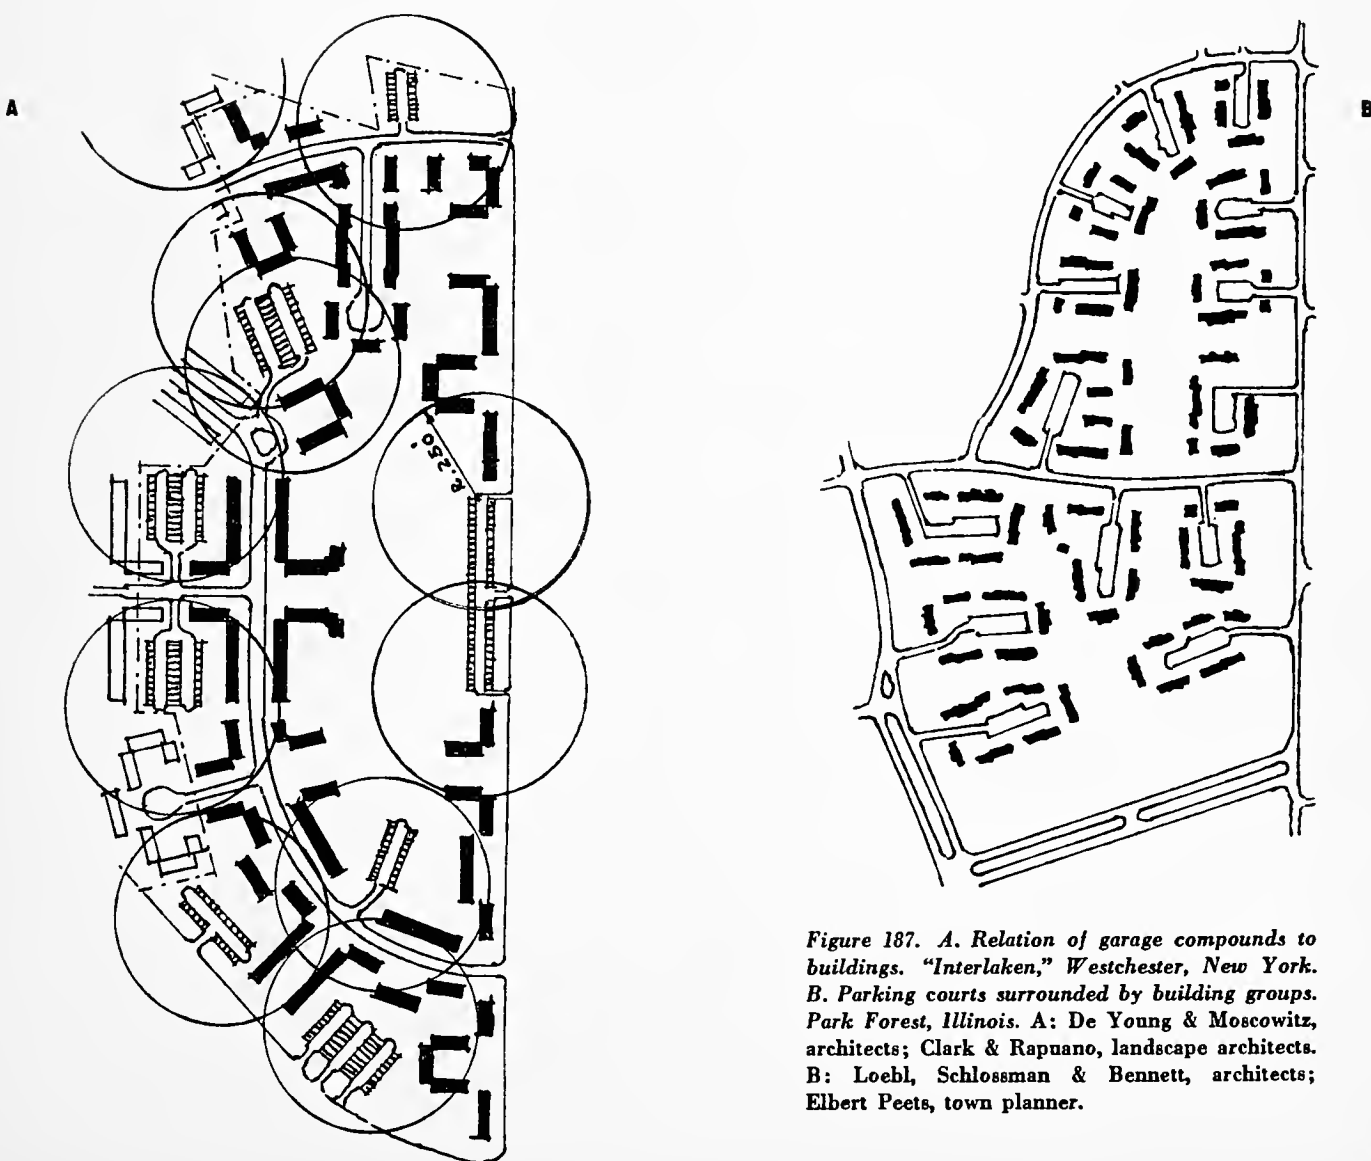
A. Relation of garage compounds to buildings. "Interlaken," Westchester, New York. B. Parking courts surrounded by building groups. Park Forest, Illinois. A: De Young & Moscowitz, architects; Clark & Rapuano, landscape architects. B: Loeb, Schlossman & Bennett, architects; Elbert Peets, town planner.
